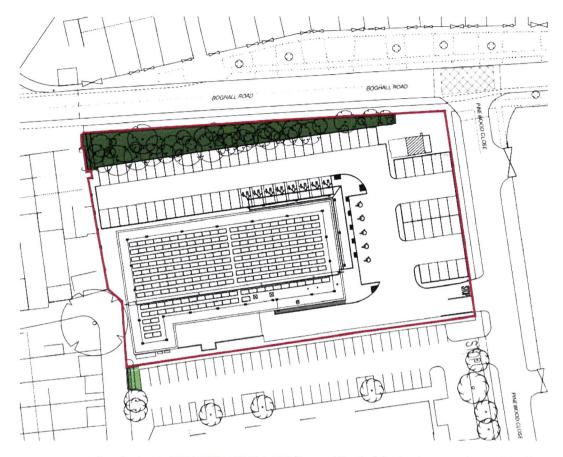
Extract from drawing no. 20984-THPK-93-XX-DR-A-0102 "Proposed Site Plan" showing the proposed site and panel layout.
